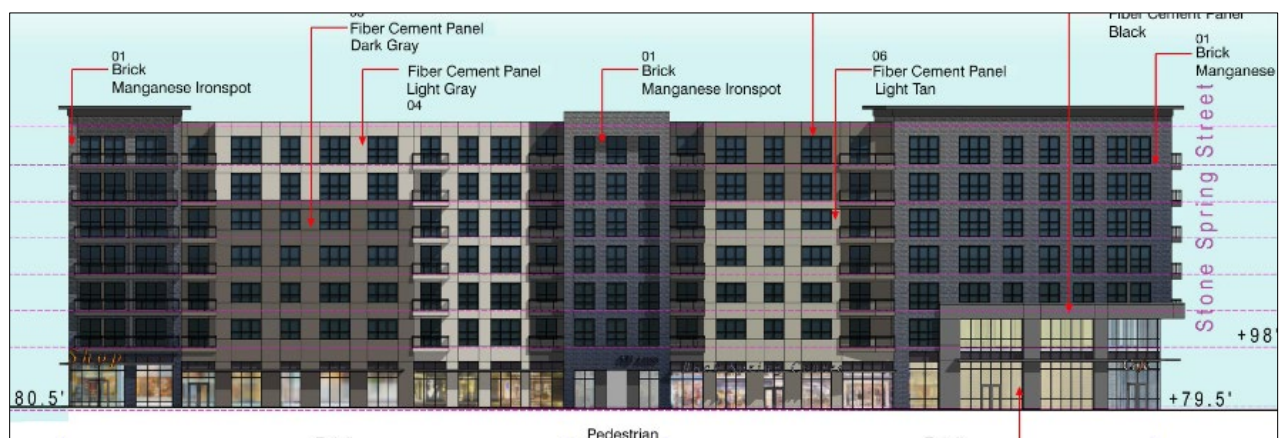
Parcel N Building Elevation View from Rock Forest Drive
